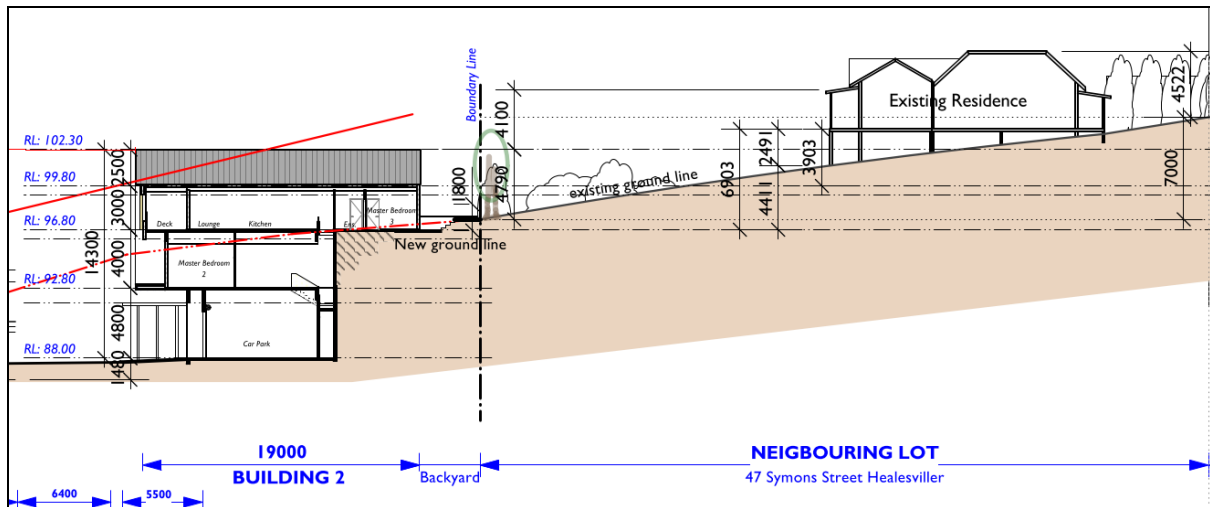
Cross section plans showing existing residential properties on Symonds Street siting above the proposed dwellings.
